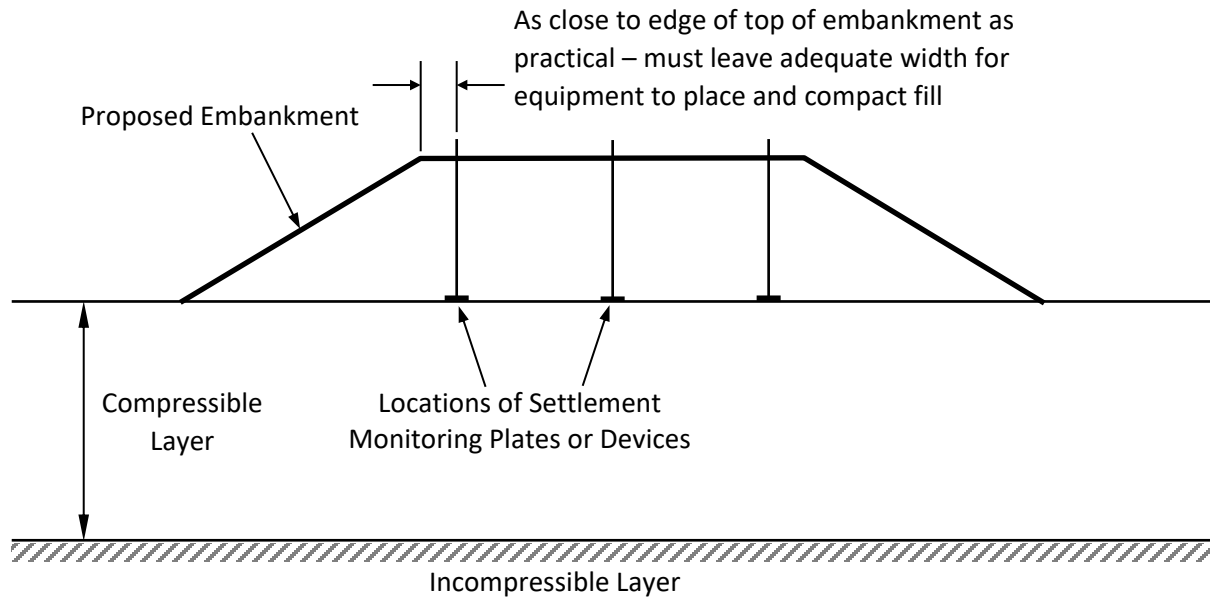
Example Settlement Monitoring Layout for Embankment and Structure
